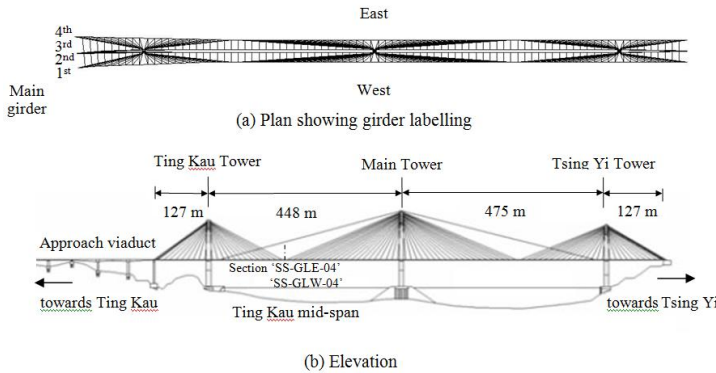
Schematic plan and elevation of Ting Kau Bridge.
